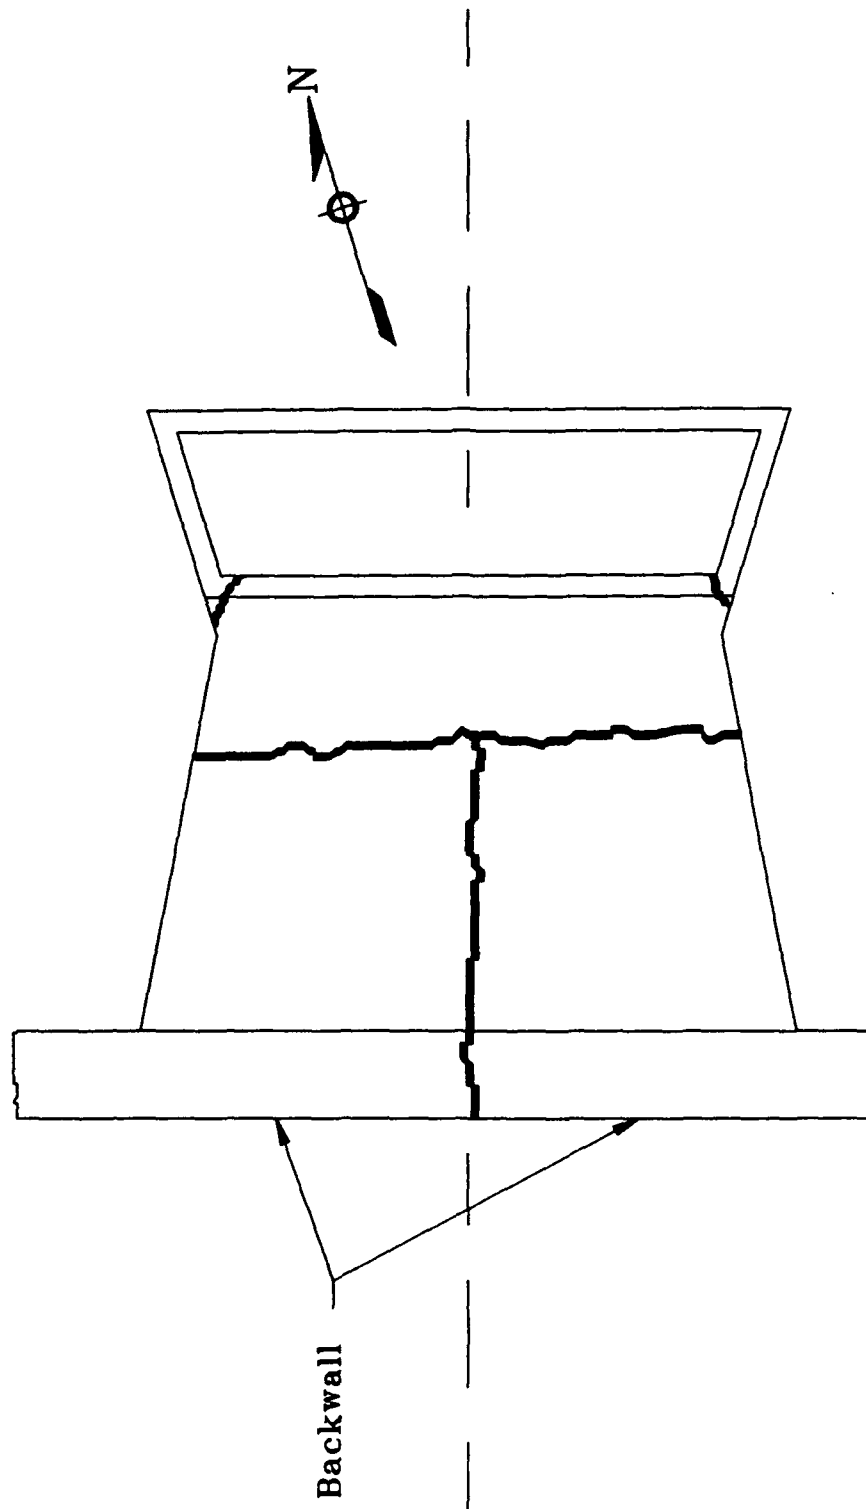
Plan: Breakup pattern of exhaust port roof, PAS-4.
